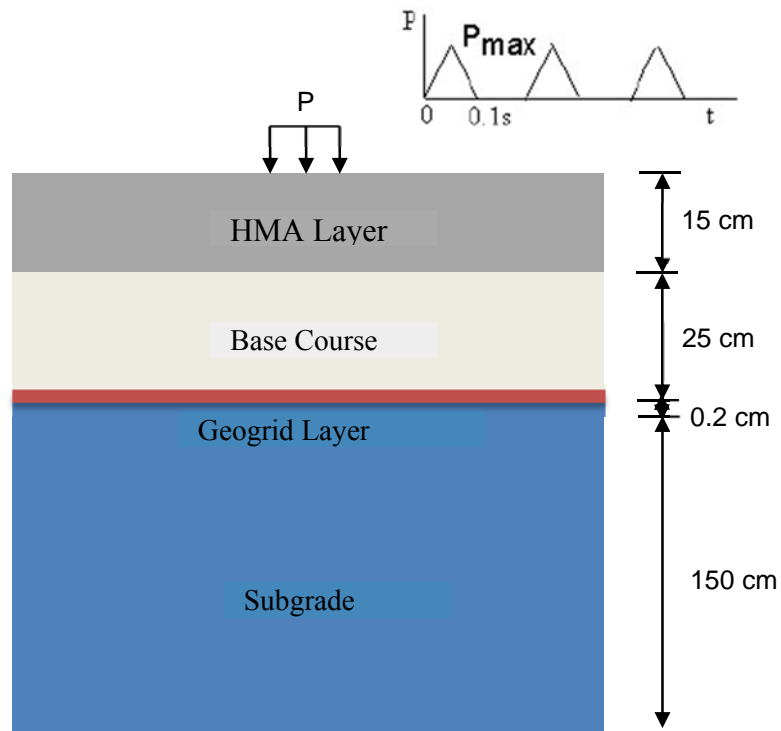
Typical Geogrid-Reinforced Pavement Structure in Soil Tank Test
